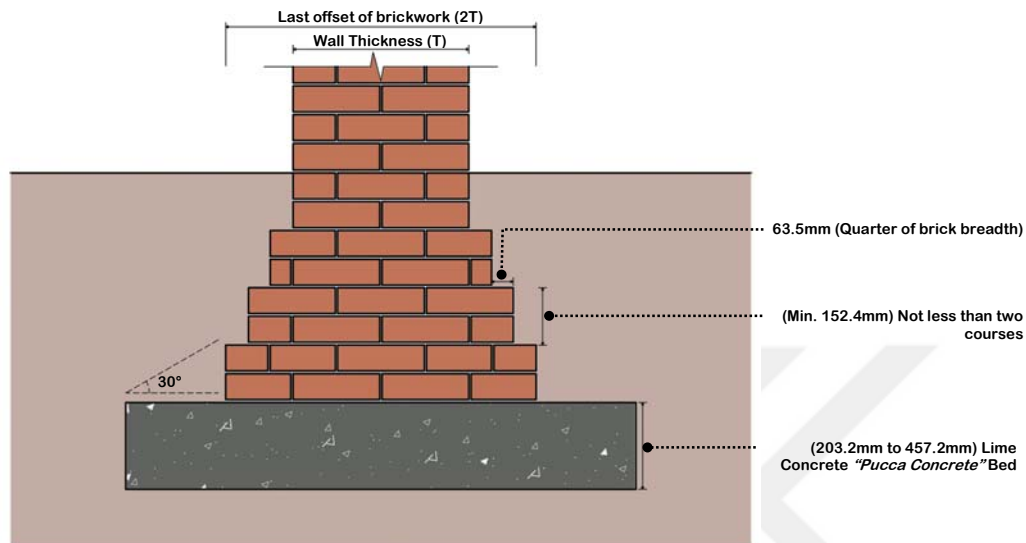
Hypothetical drawing of Lahore Museum Stepped Strip Foundation
